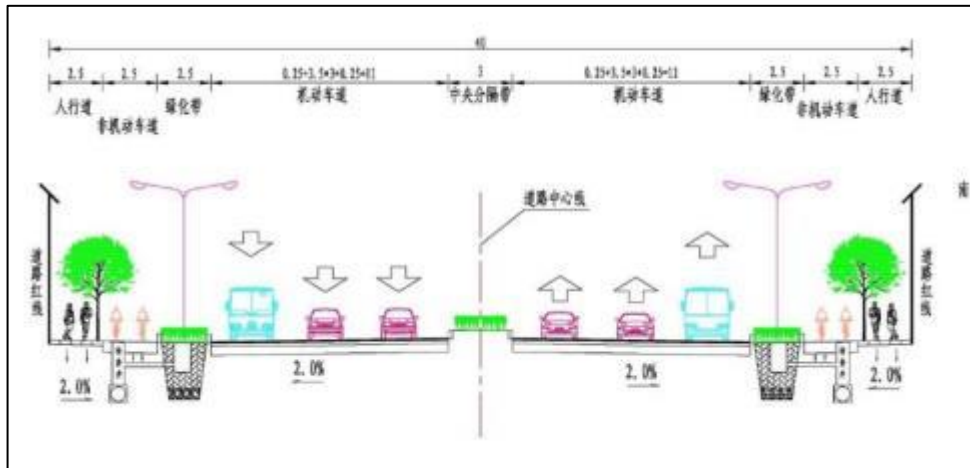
Cross Section of Binhe Road (Expressway Connector-North Avenue)
